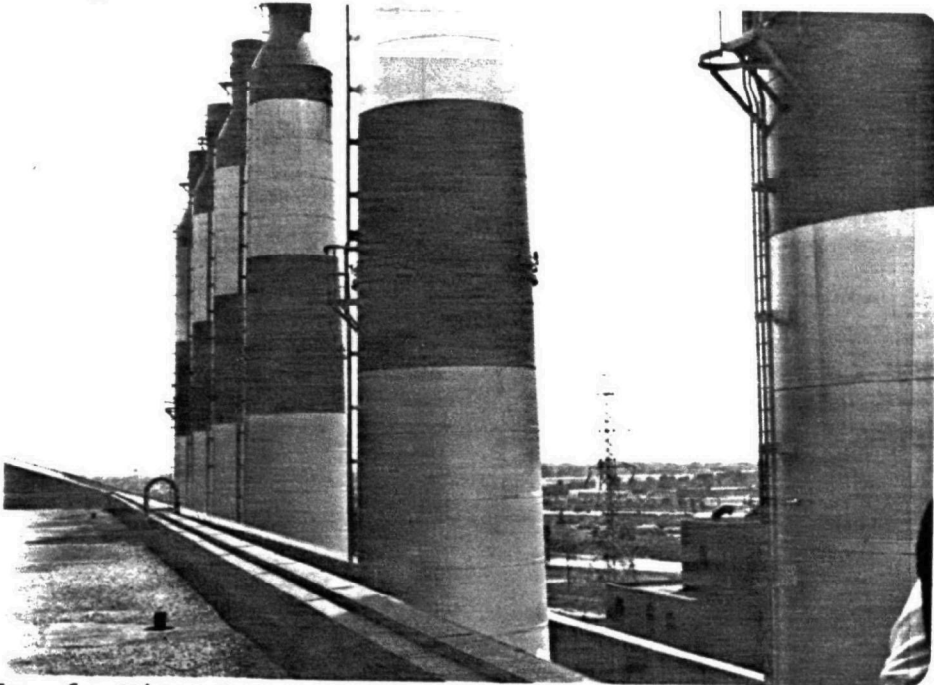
View from the roof of Boiler 6 looking southeast. Stacks 1 through 6 are shown from left to right.
